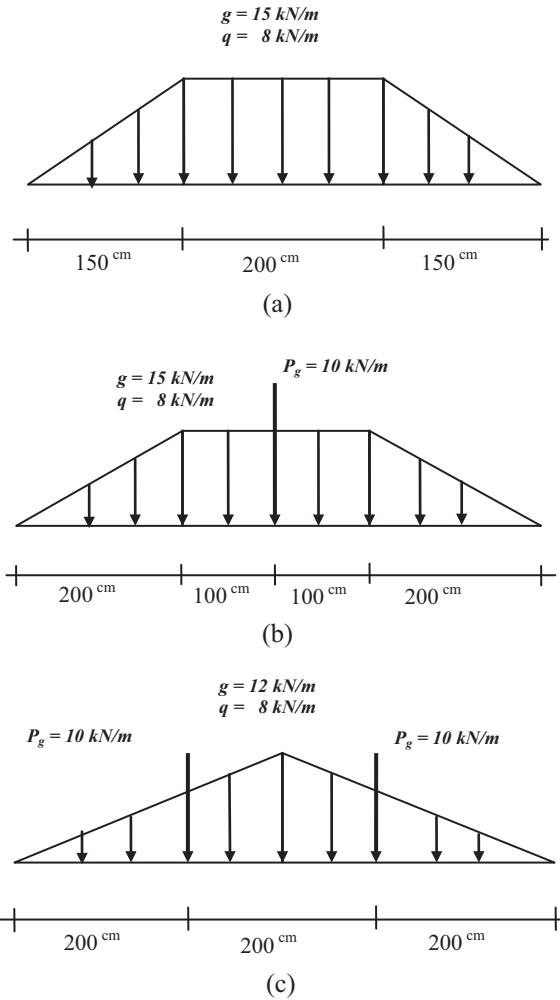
Loading for five-bay five-storey frame (a) for beams at first and last spans, (b) for beams at second and fourth spans, and (c) for beams at third span.
